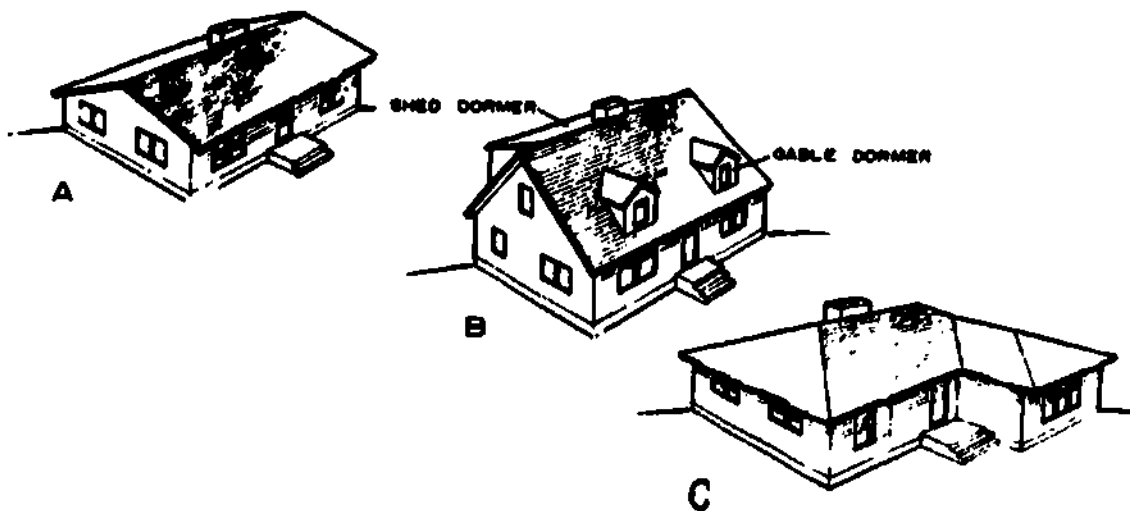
A, Gable roof; B, gable with dormer; C, hip roof.
